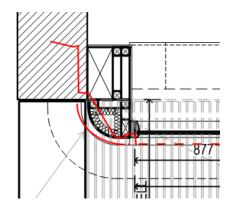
Corner pilasters shopfront details with previous shopfront outlined in red
